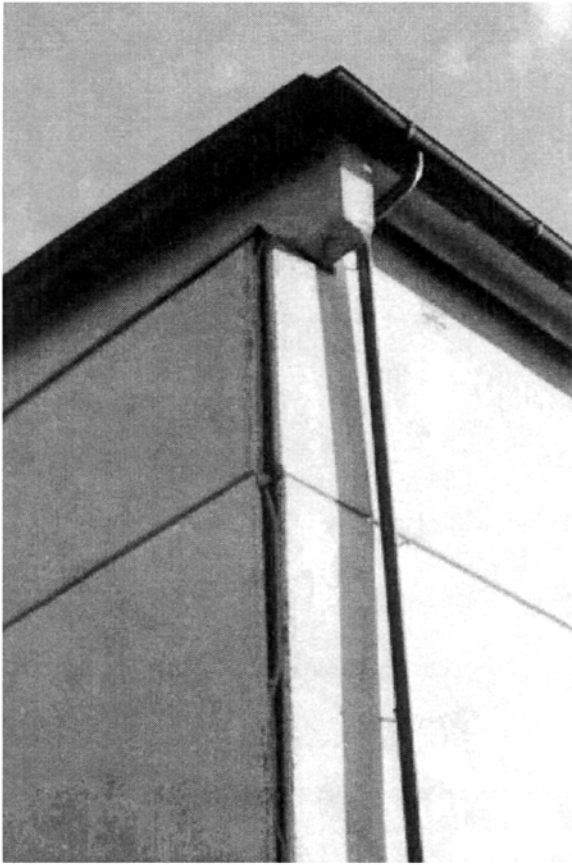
Farm building in precast concrete sections: Colfiorito
